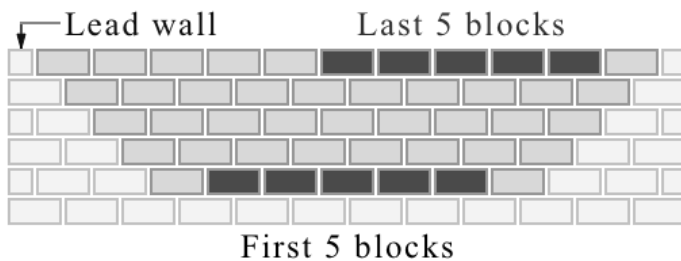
PRE-BUILT LEAD WALL TO BE COMPLETED FROM SECOND TO SIXTH COURSE
